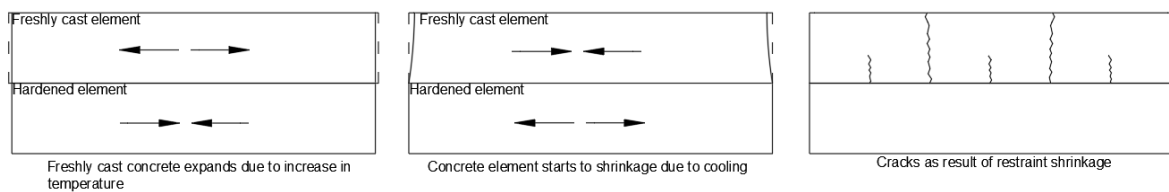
Schematization of cracks in in-situ wall elements as result of restrained deformation of adjacent floor.
